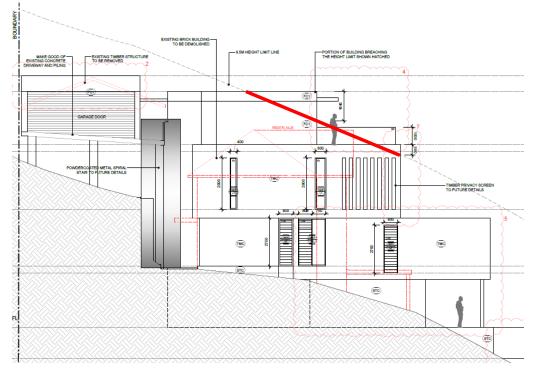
Southern elevation plan extract showing 8.5 metre building height standard breaching elements
